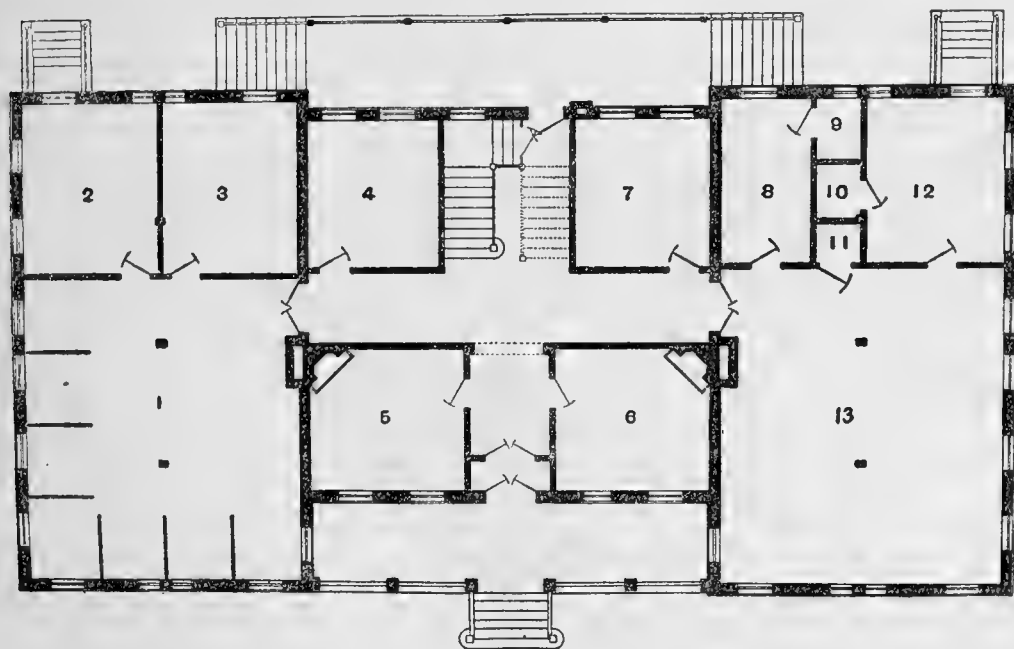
Plan of main floor of laboratory building. 1, General laboratory; 2, library; 3, chemical laboratory; 4, sterilizing and embedding room; 5, general office; 6, director's office; 7, stock room; 8, packing room; 9, closet for office storage; 10, alcohol closet; 11, janitor's closet; 12, preparation room; 13, museum.
